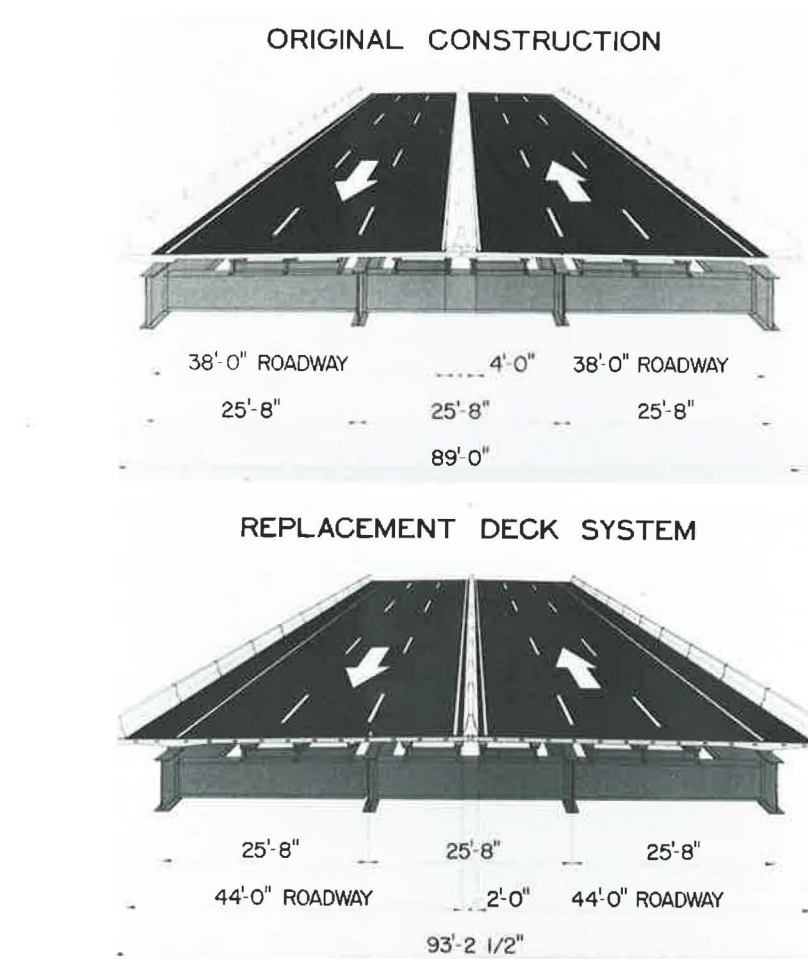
The replacement deck system provides 44-ft roadways constructed of full-roadway-width, precast, transversely post-tensioned, lightweight concrete panels. The system permits space for disabled vehicles, which previously had caused commuter traffic delays.
